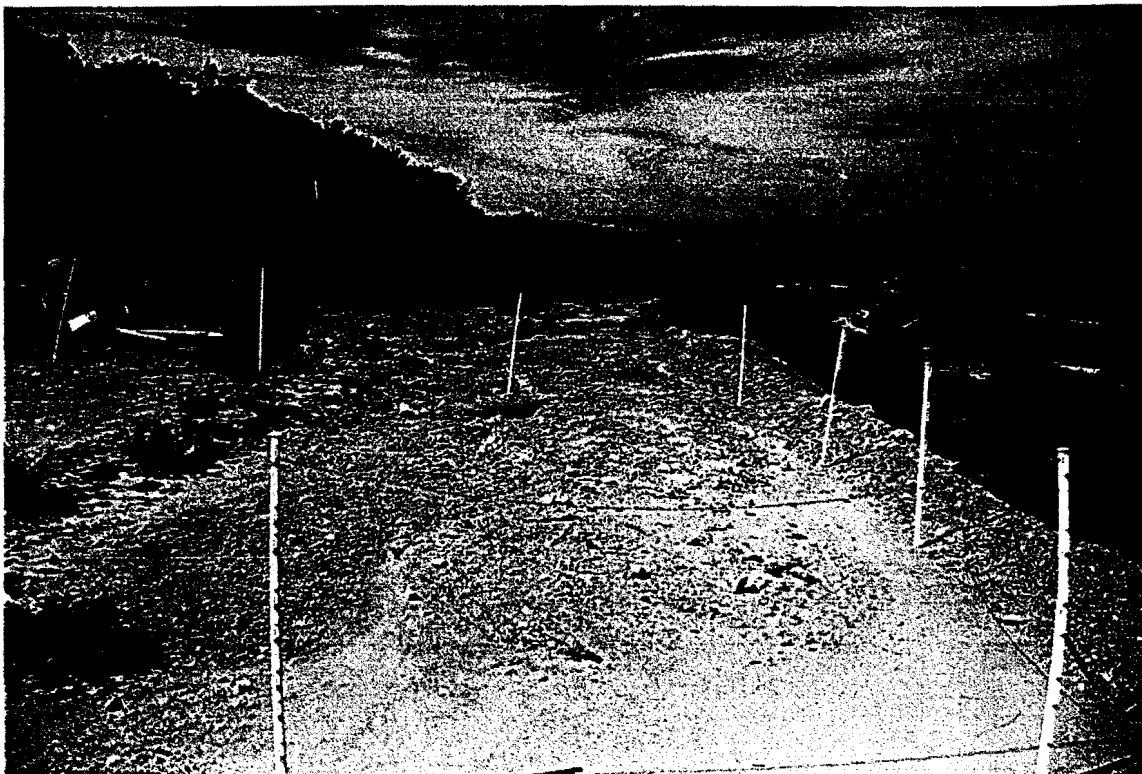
This photograph shows the extension of the trailer pad which was used as an occasional horse pen. Cleanup of the site will precede minor grading which will eliminate the landform alterations by redistributing and recompacting the fill soil on the right side of the pad towards the inside shoulder of the present small pad or wide road.
